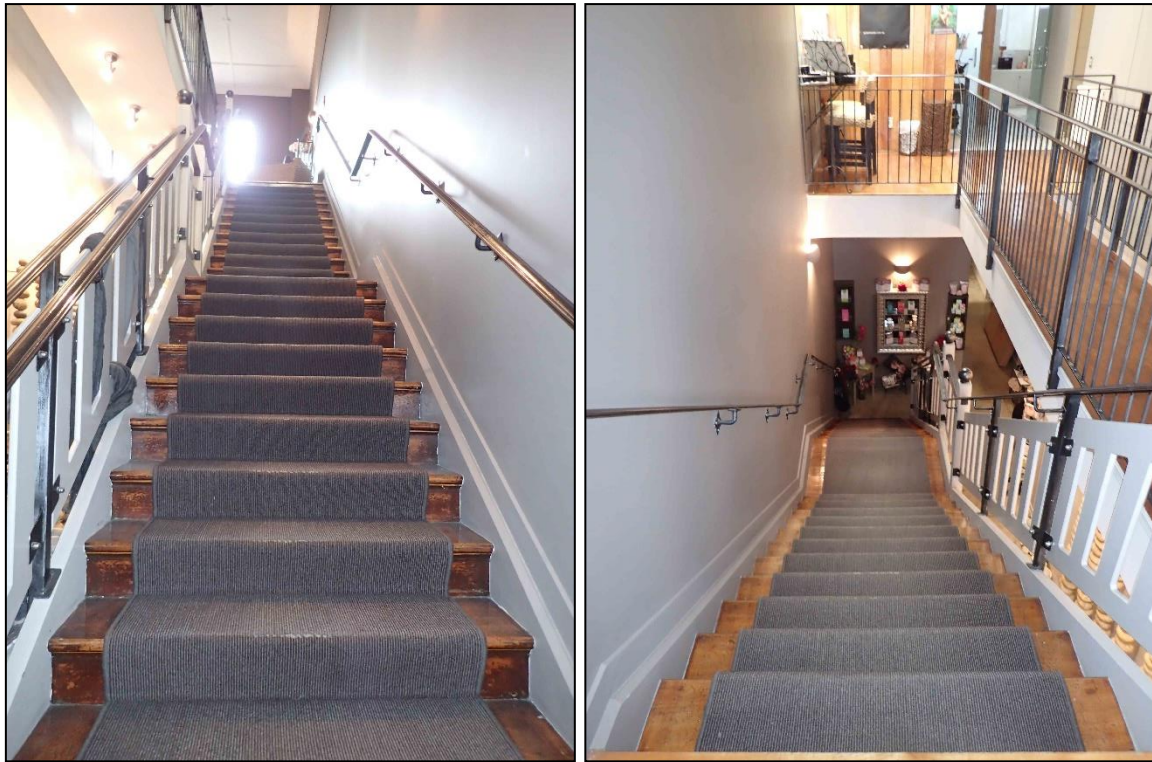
Ground floor of 18 Kelvin Street, looking west.
